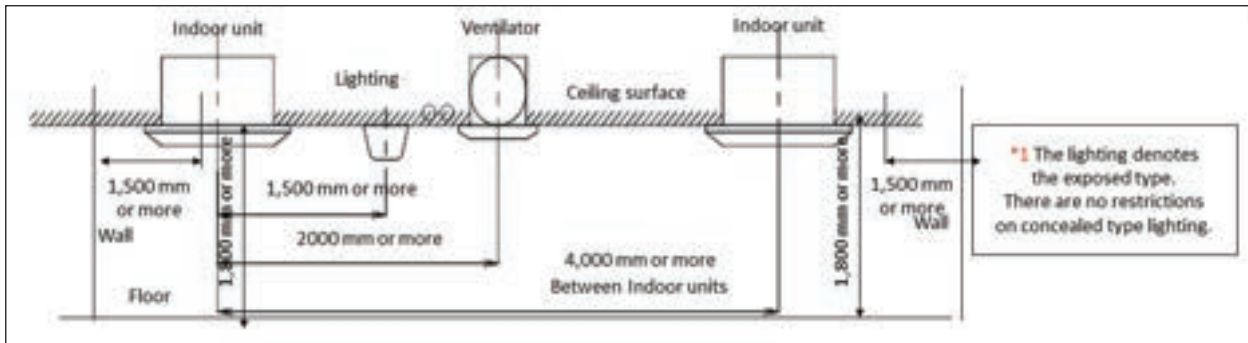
Indoor cassette type indoor unit installation with grid ceiling
